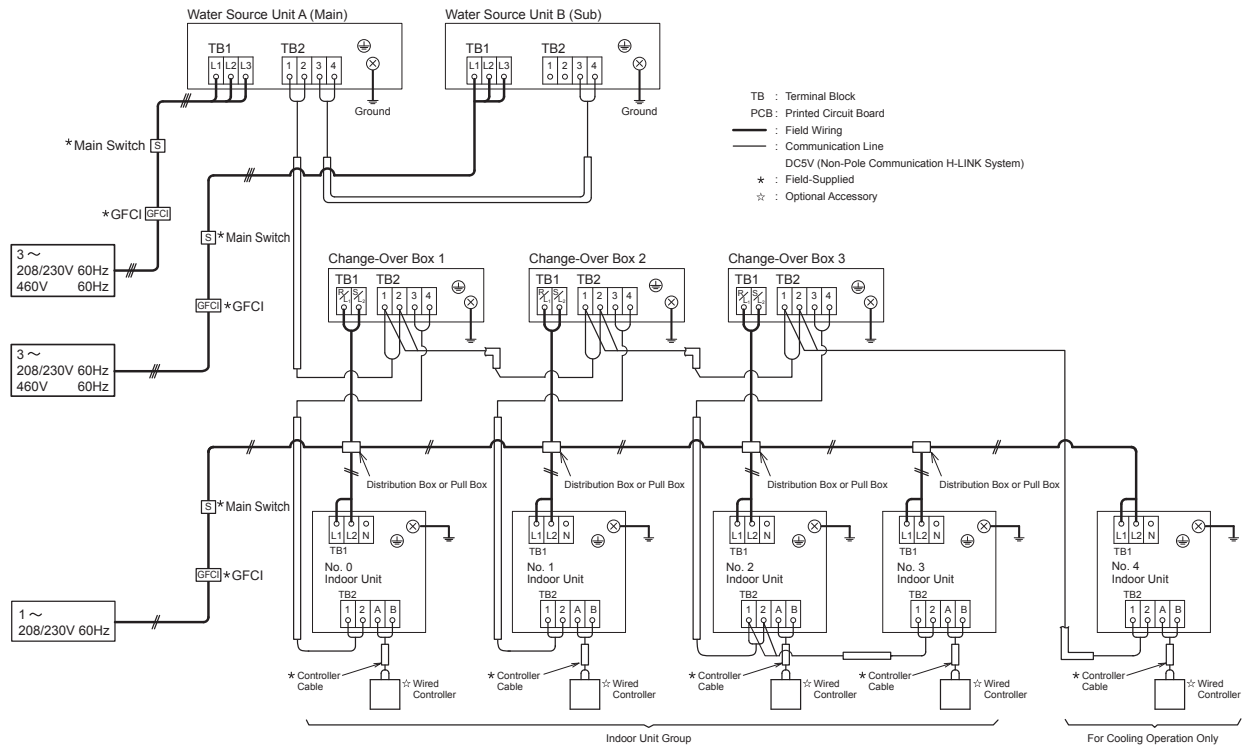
Layout for Electrical Wiring Connection (Heat Recovery System)
